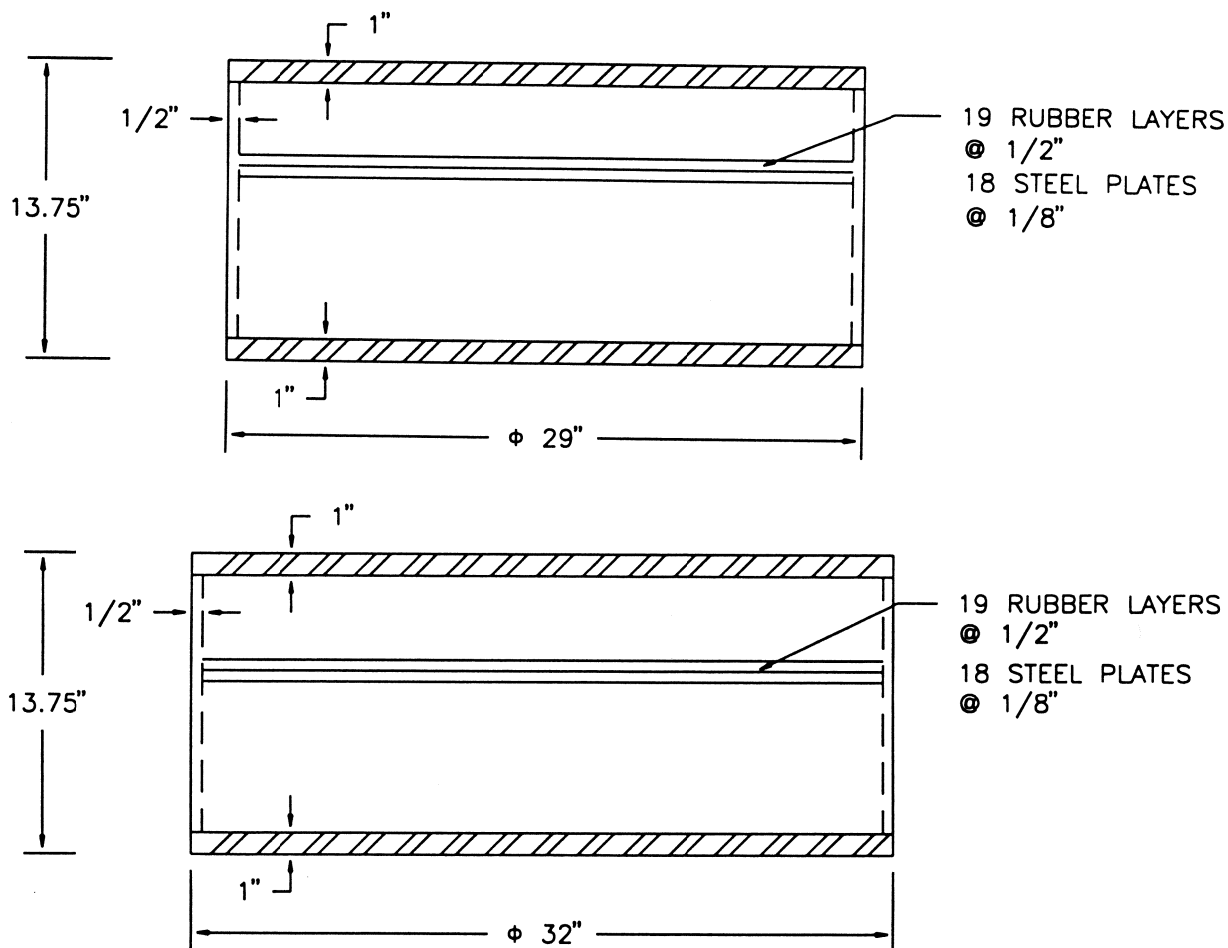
Construction of (a) High Damping Rubber Bearing, (b) Low Damping Rubber Bearing.
